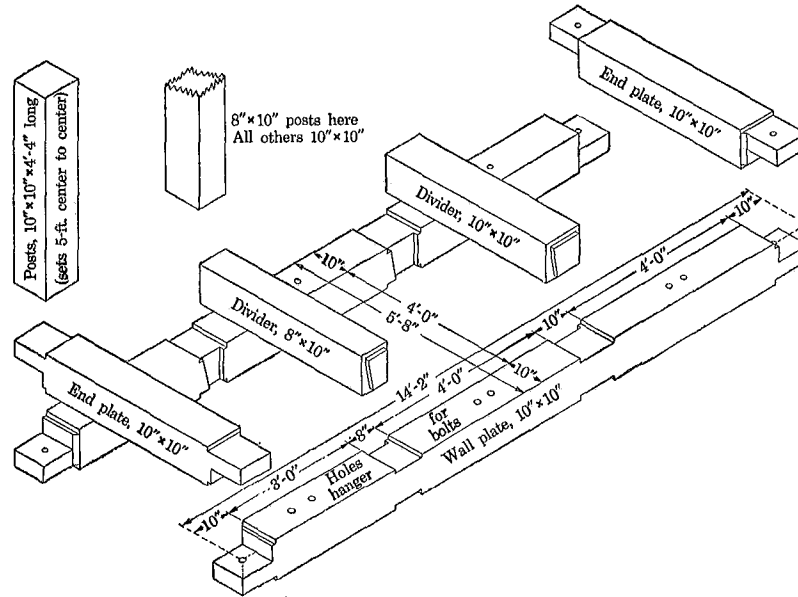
Three-compartment shaft set, Magma mine. (All daps 1 inch. Corners fastened with wooden dowel pins.)
